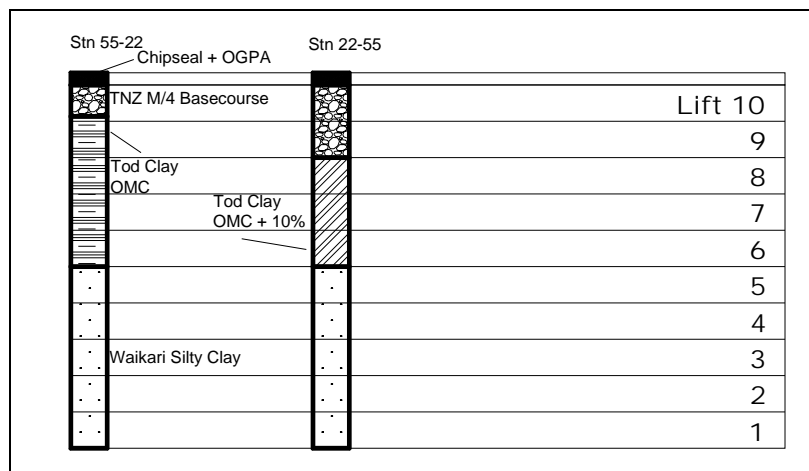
Pavement structures used for Sections A, B (left) and Sections C, D (right) for Pavement test 2.
